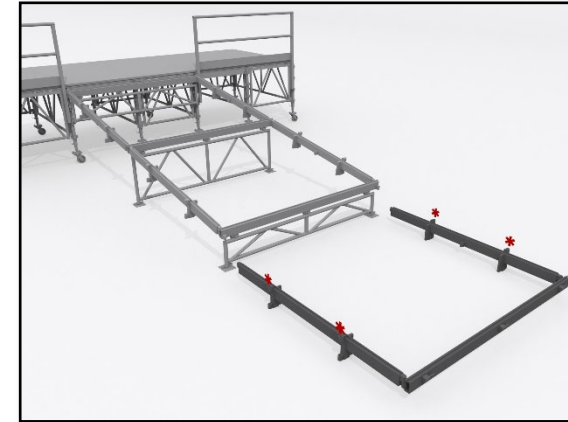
Secondary Beam Type One's into Primary Beam Type One
